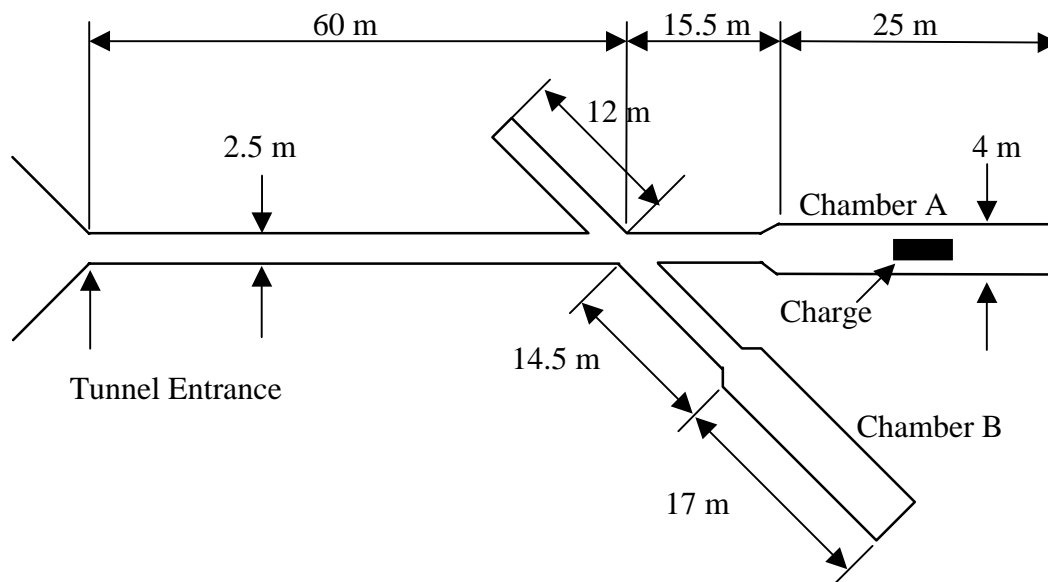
Plan View of Tunnel System as Modeled in Calculations
